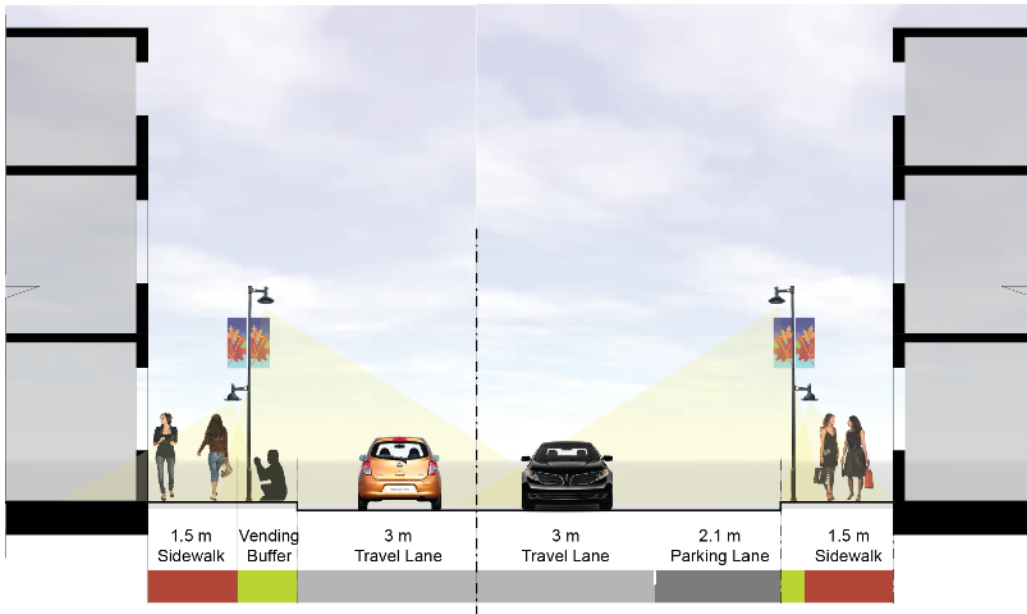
Proposed cross section of 12M ROW low volume road showing alternatives to incorporate vendor space or parking space.
